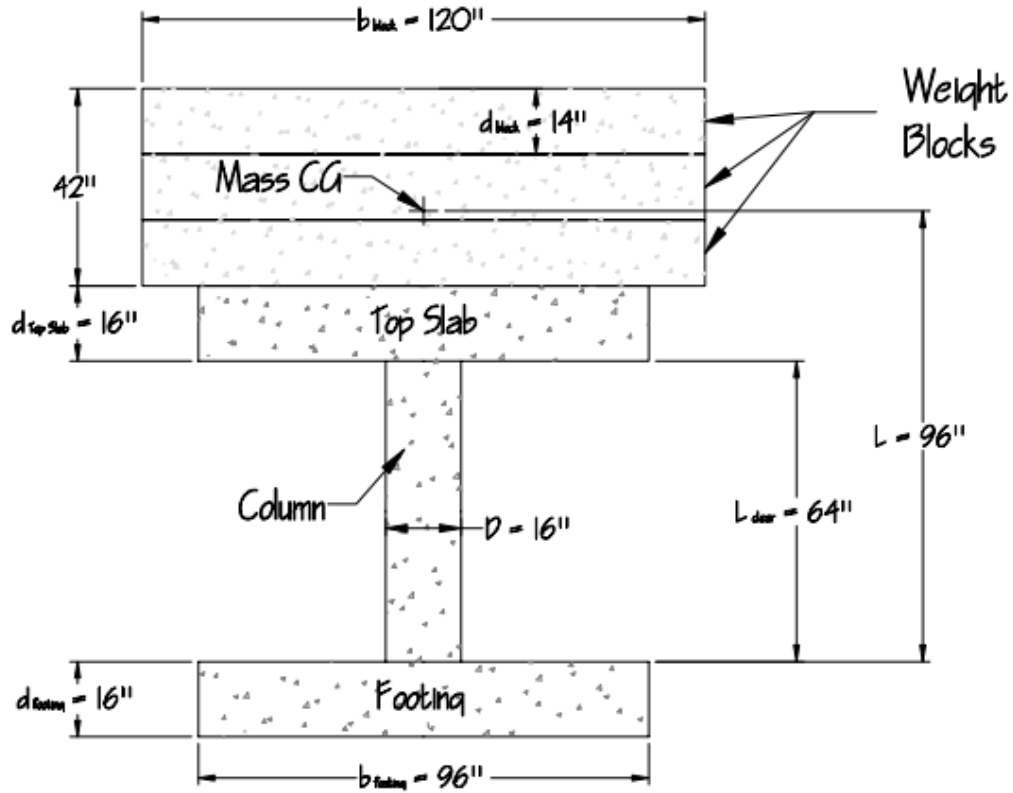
Elevation of specimens A1, A2, B1, and B2 (Hachem et al. 2013)
